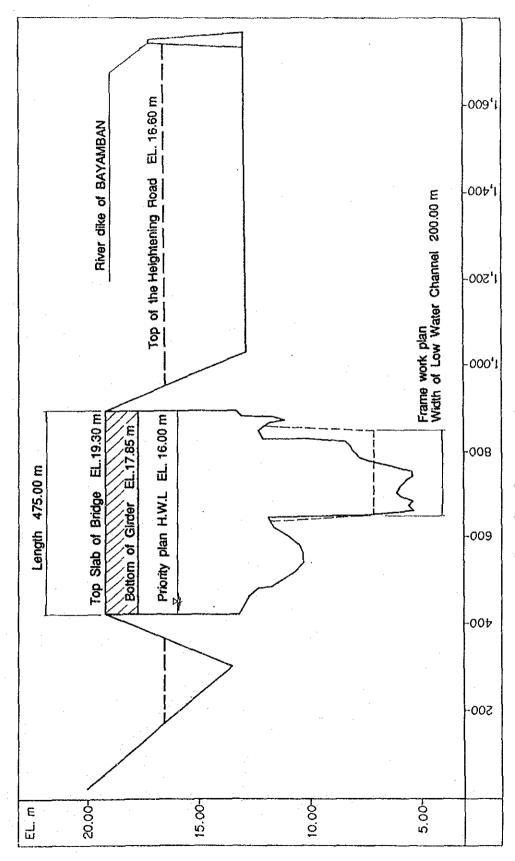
RIVER CROSS SECTION AT WAWA BRIDGE SITE
